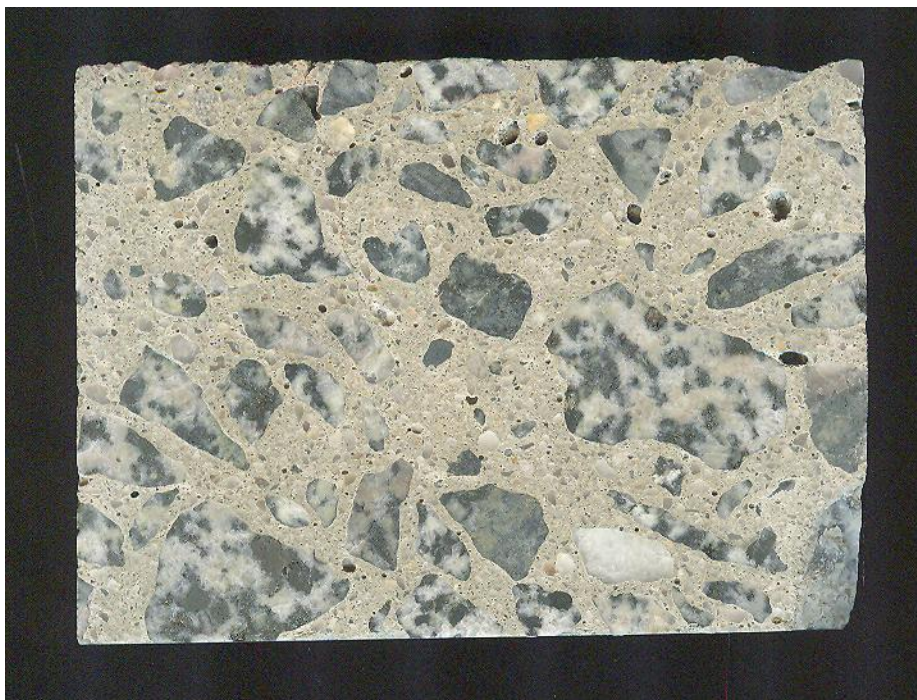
Scanned image of polished surface prepared from bridge deck 7N, core C-8. Bridge deck surface is at top.
